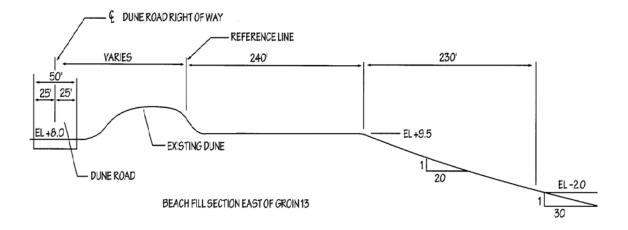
Minimum Design Cross Sections East of Groin 13. Offshore slope extends to the intersection with the existing bottom.
